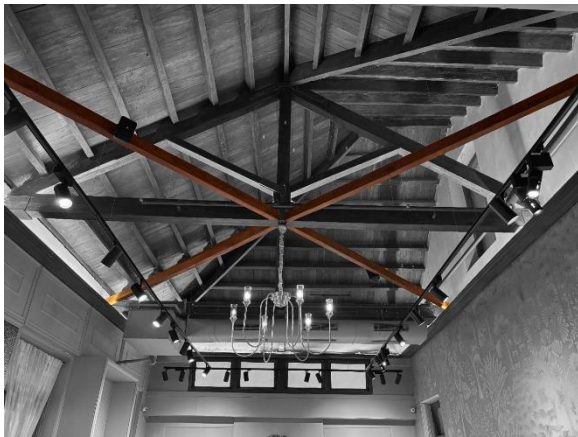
Diagonal bracing members added to strengthen the existing timber roof framing system.
